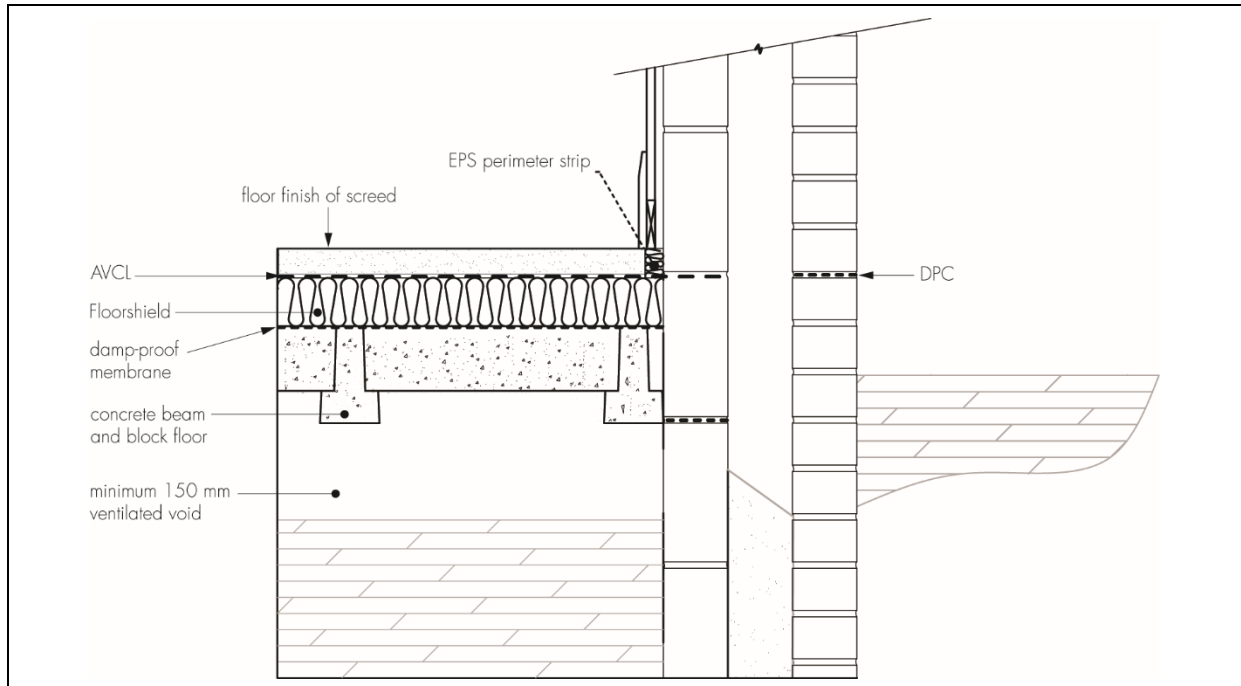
Typical installation details — suspended concrete ground floor with AVCL only (screed finish)
